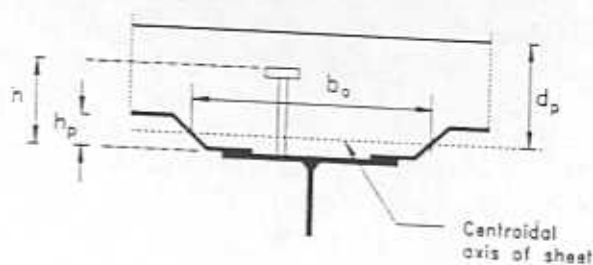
Beam with Profiled Steel Sheeting Continuous Across the Beam
